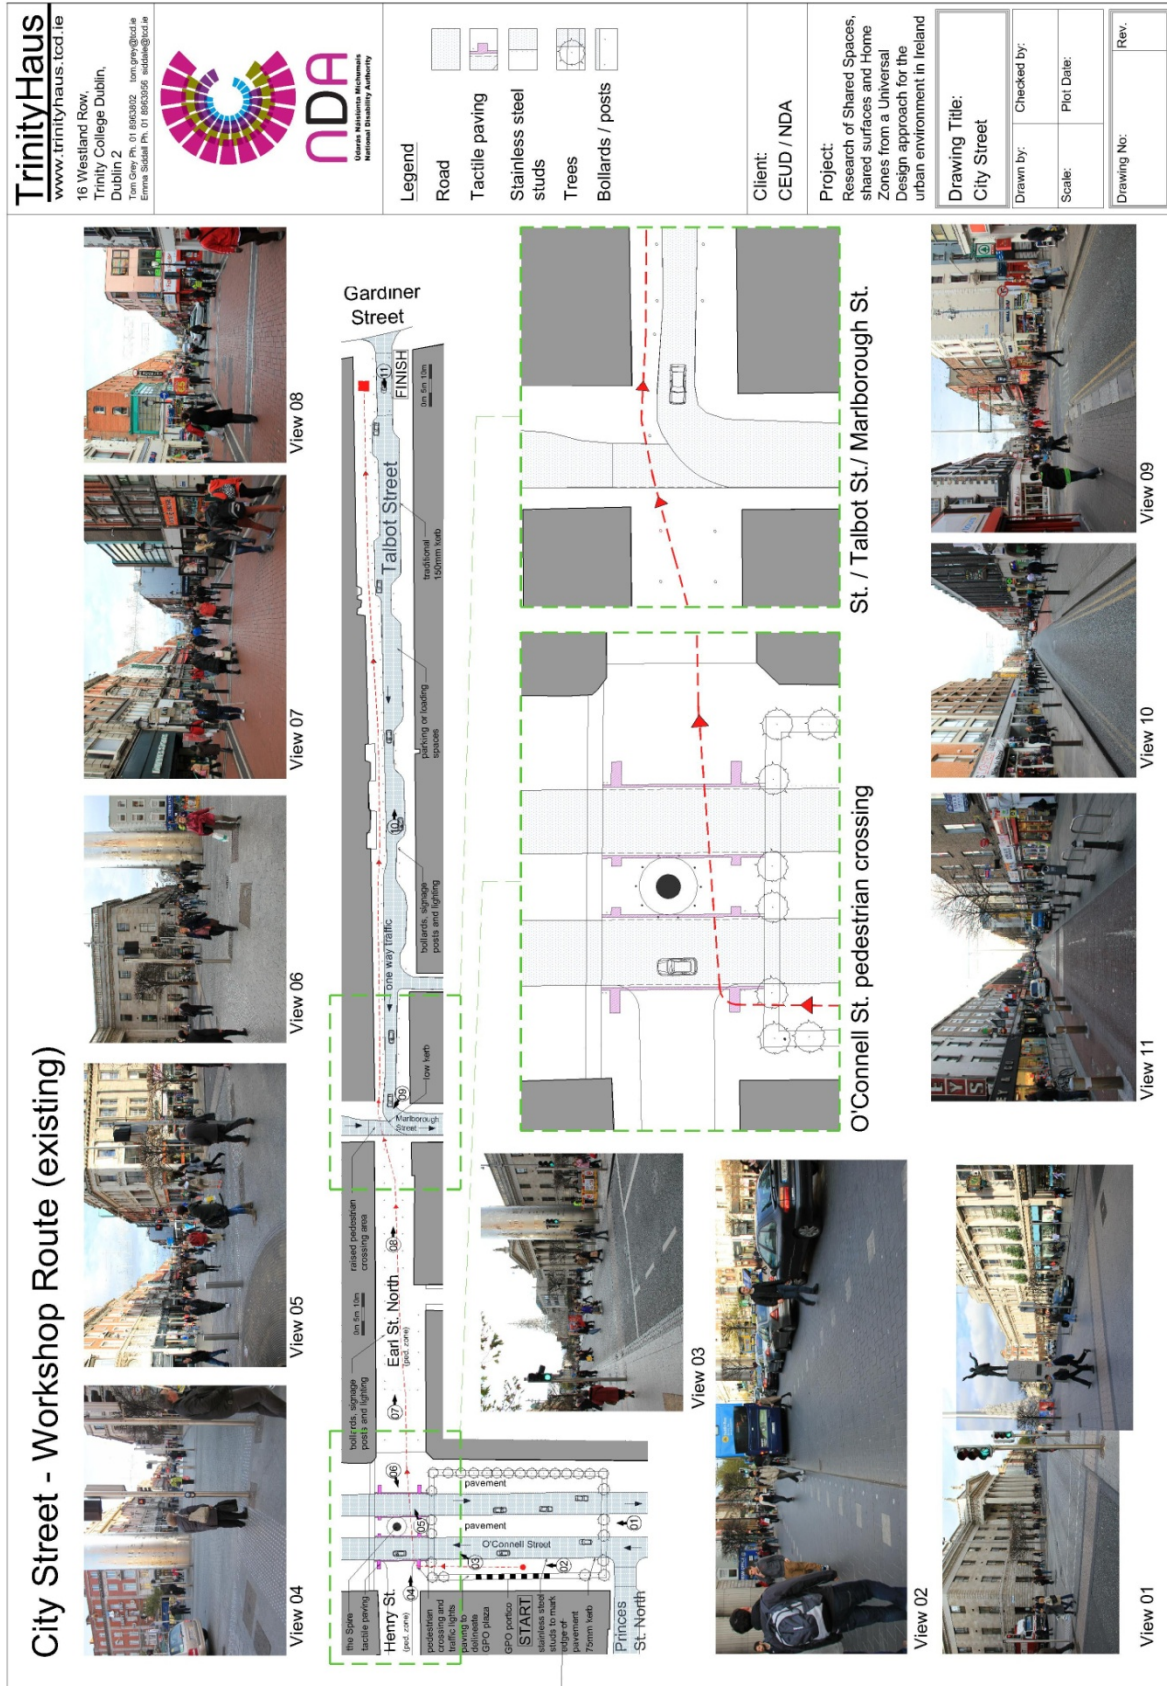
Plan drawing and photos of the traditional city street route (exercise 1, route 1
